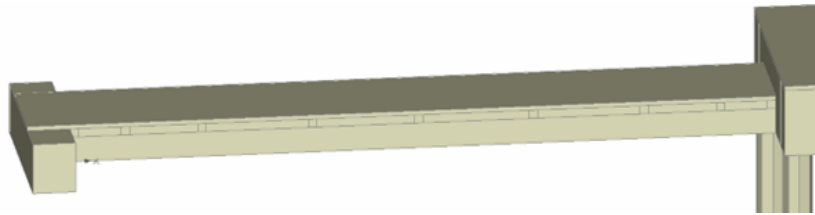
Numerical model of reinforced concrete footbridge connected to a UHPFRC slab by shear notches.
